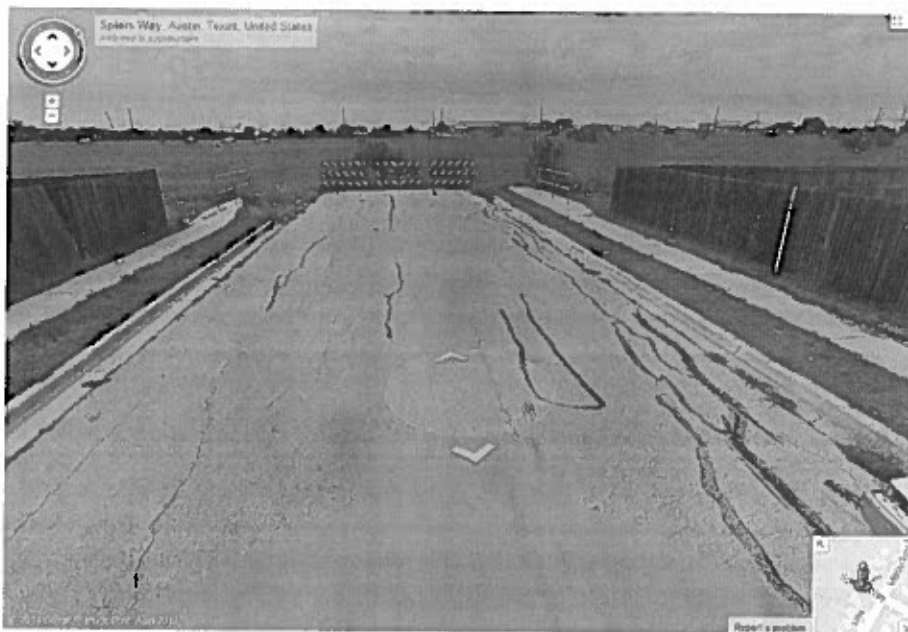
Google photograph of the Spiers Way stub street looking into the proposed subdivision and toward the Del Valle Elementary School.
